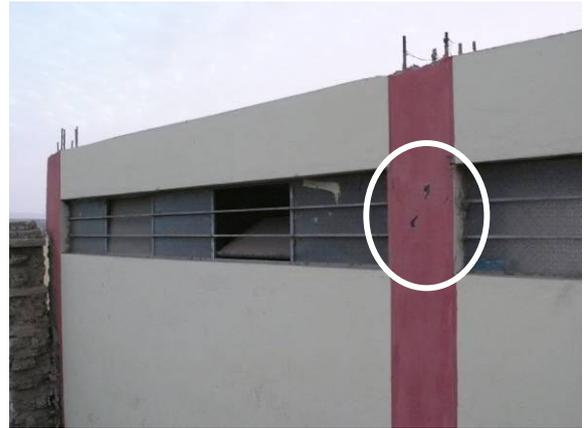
RC-buildings with masonry panels suffered slight shear damage (Beatita de Humay School, Humay)
